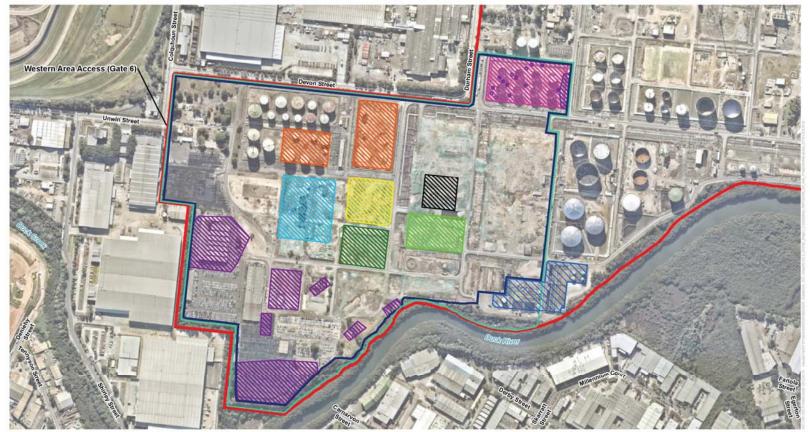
WESTERN AREA PROPOSED REMEDIATION LAYOUT
